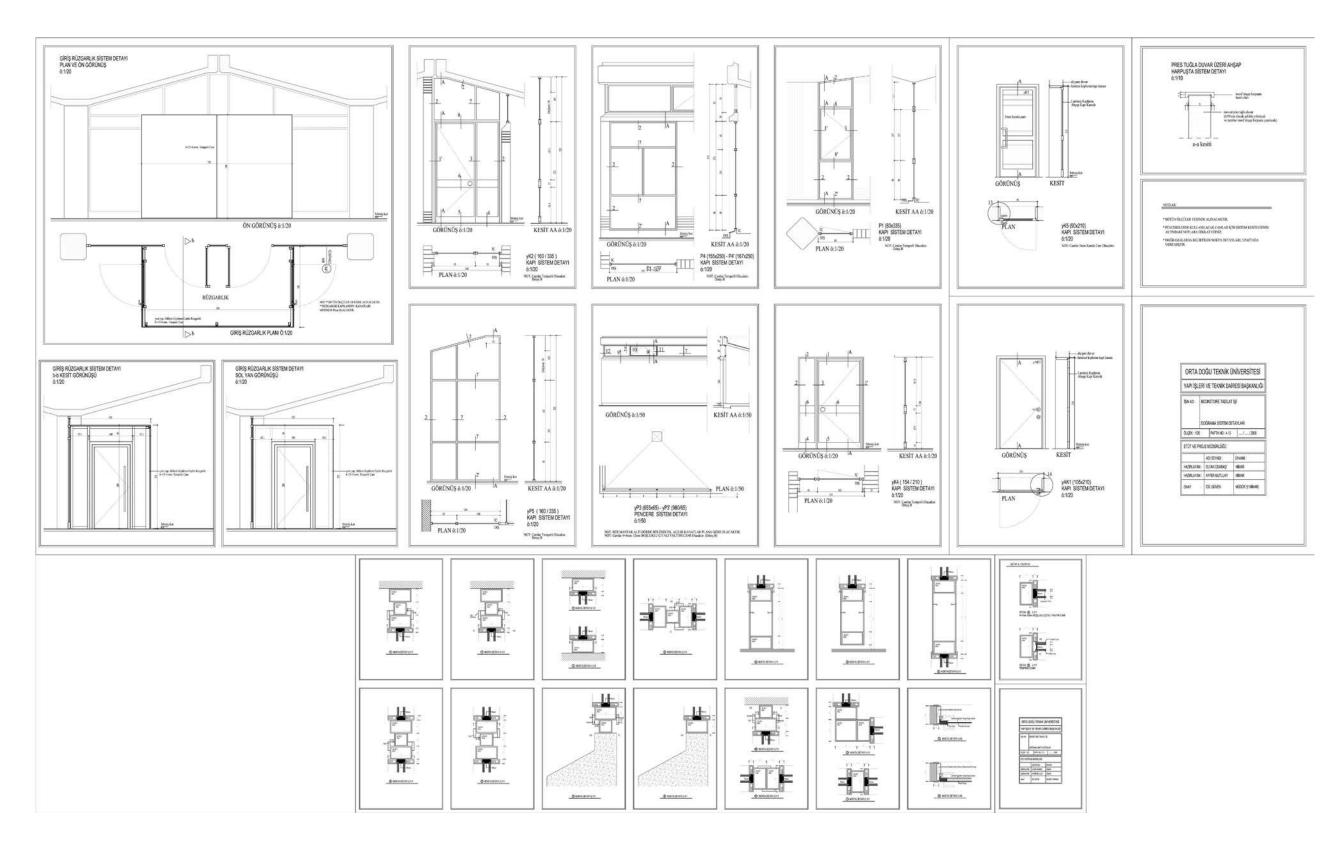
Renovation Project Prepared by Architects of METU Directorate of Construction & Technical Works, Joinery Details, 2008 Source: METU Directorate of Construction & Technical Works
